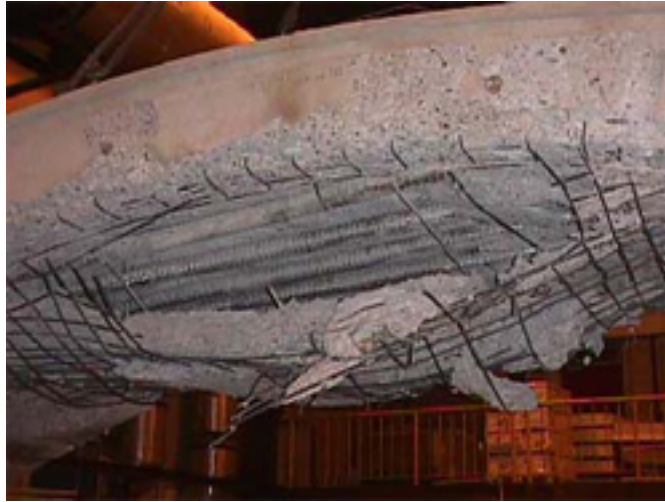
Example of severe spalling on reinforced concrete
